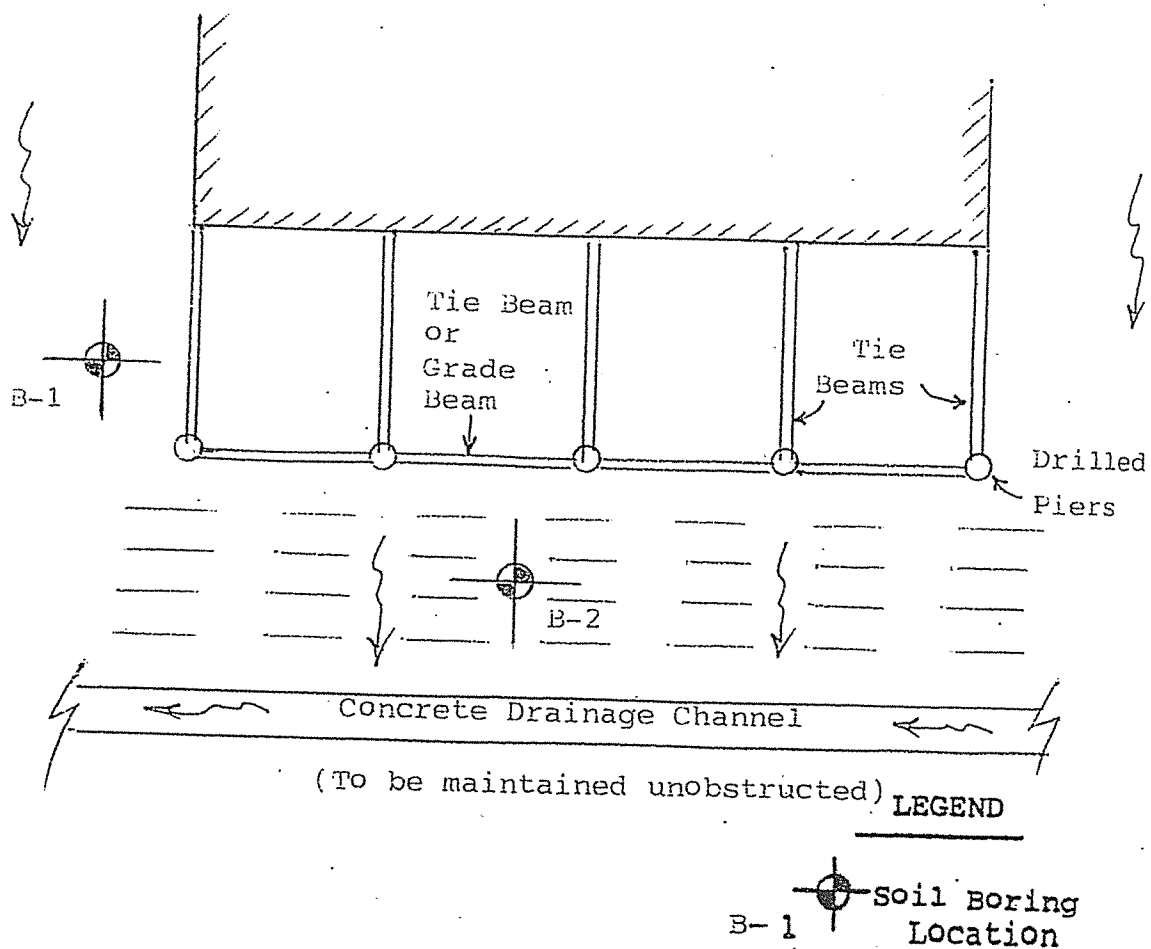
SITE PLAN AND SOIL BORING LOCATIONS (Not to Scale)
